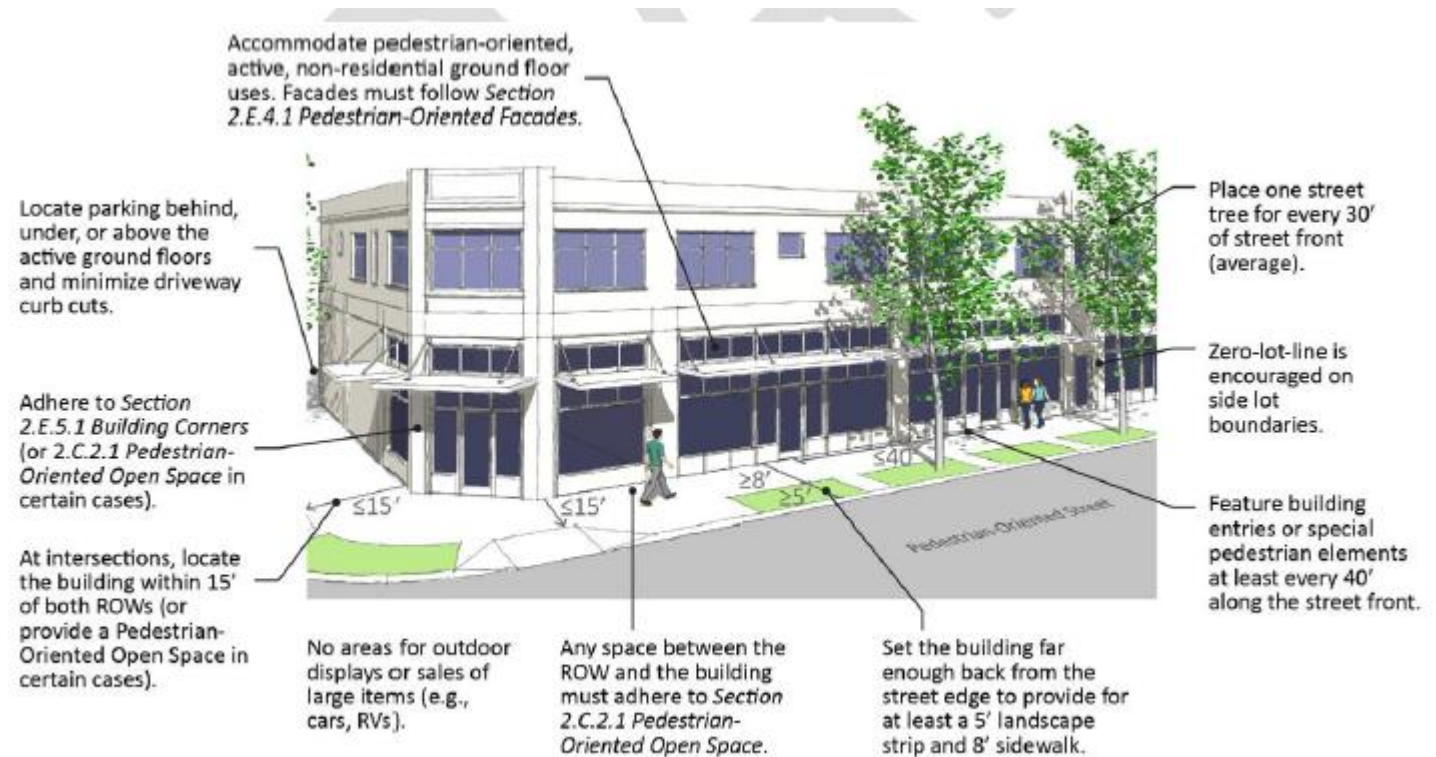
B.2-1. Pedestrian-Oriented Street requirements summary.
